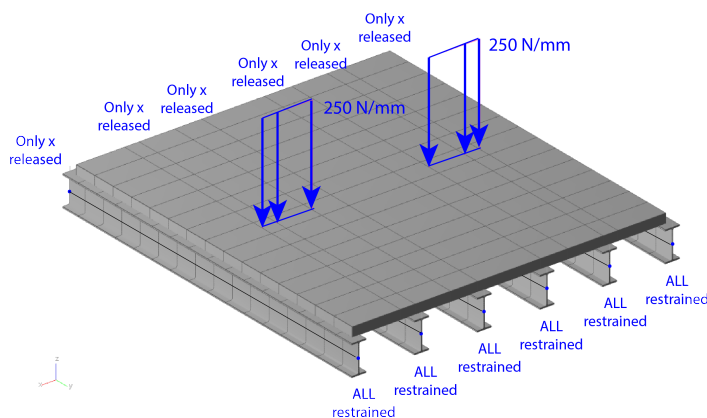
Loaded situation of one deck field with clamped connections to the cross girders
